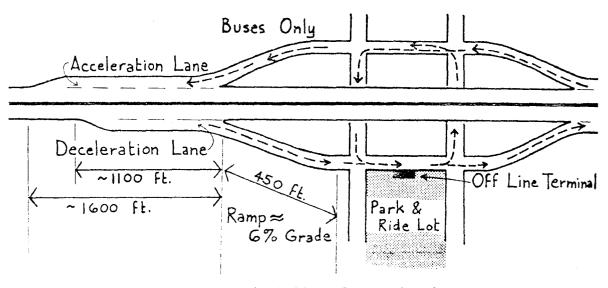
Typical Site Plan at Station, Narrow Guideway for Buses Only
